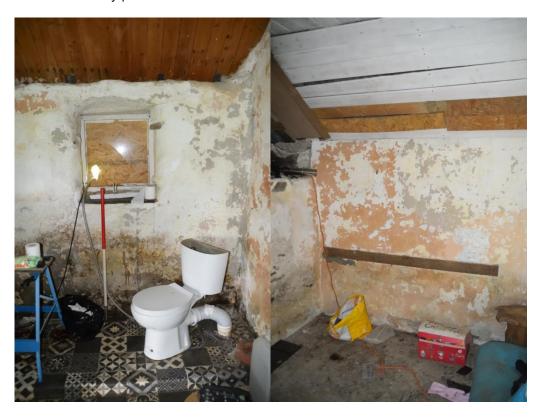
(Left) rear wall and window of room 2B (right) rear plaster rendered wall of room 2A (CPAT photo 5079-053 and 60).
